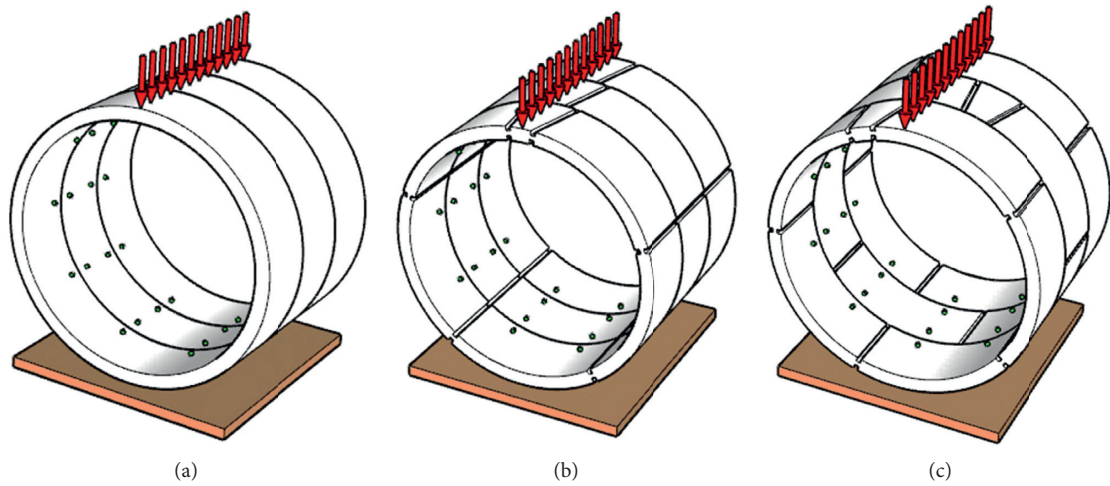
Three types of segmental lining. (a) Uniform rings. (b) Straight-jointed rings. (c) Stagger-jointed rings.
